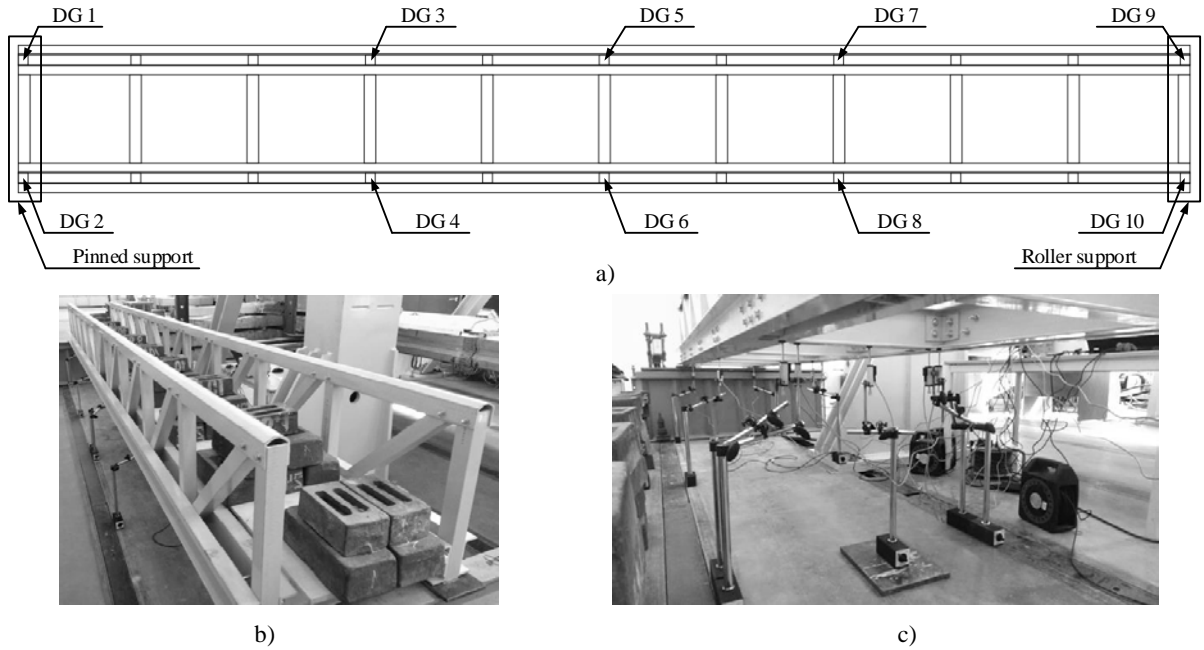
Arrangement of the displacement gauges (a) and (c); load distribution on a wooden bridge deck (b).
